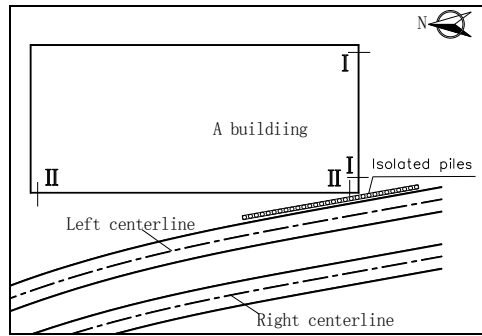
Plane sketch of location among tunnels, building and isolated piles
